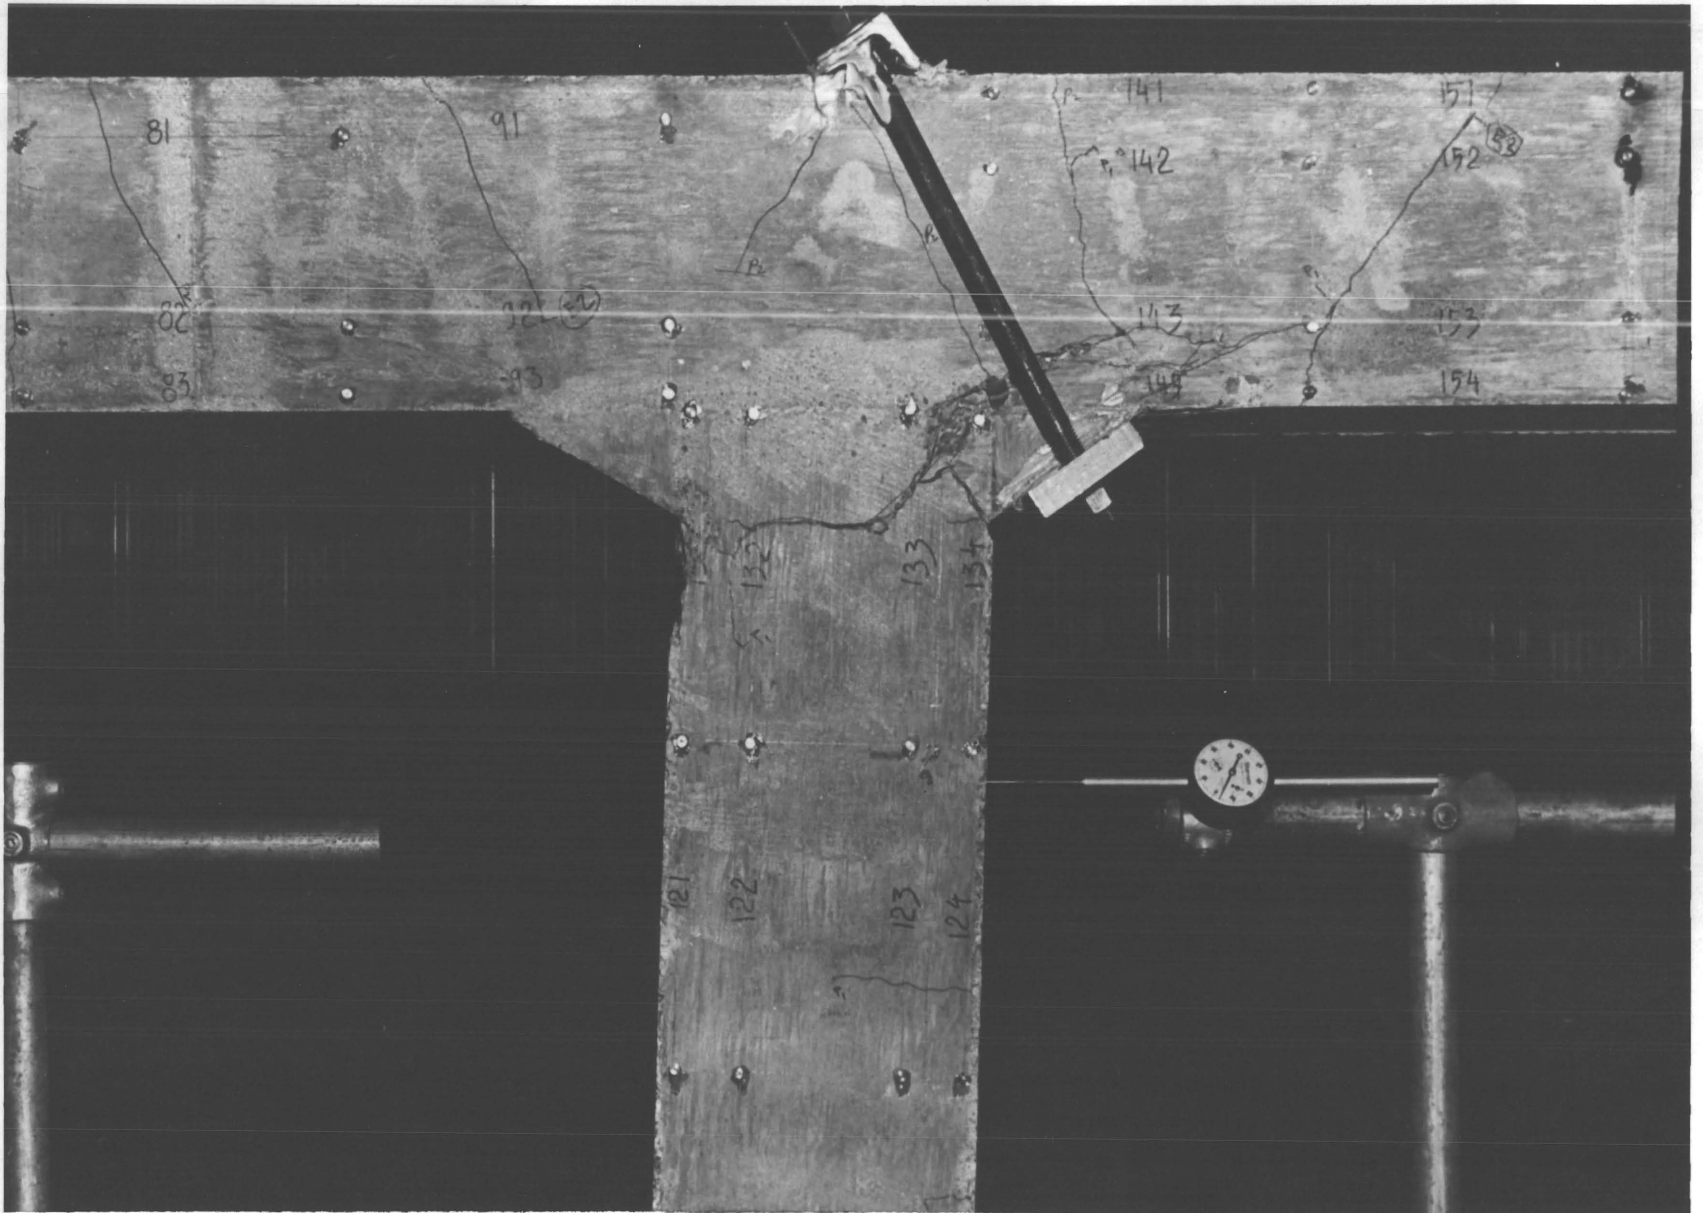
Frame BF-2, Outside Stirrup at Middle Joint.
